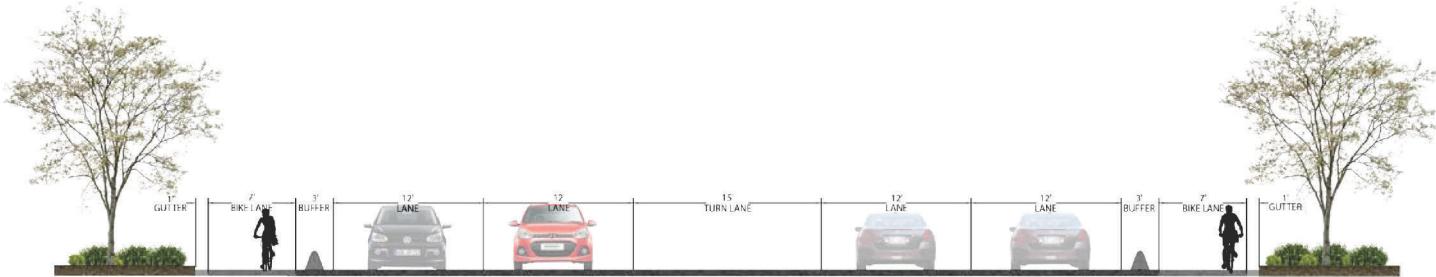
Jordan and Salt Lake City Canal Trail typical sections of protected bike lanes along 900 E.
